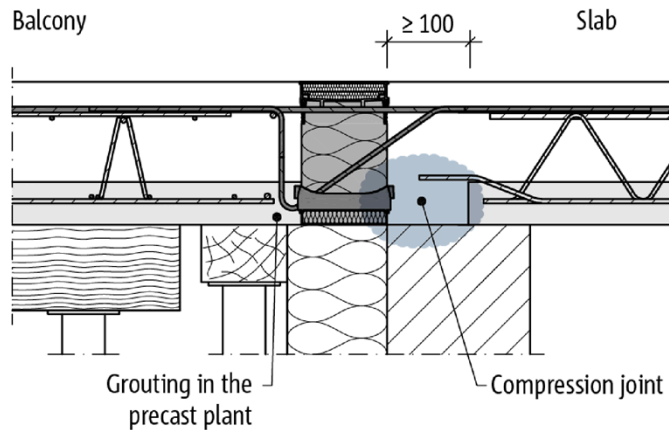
Schöck Isokorb® Type K with CCE or SCE and prefabricated concrete slab, compression joint
